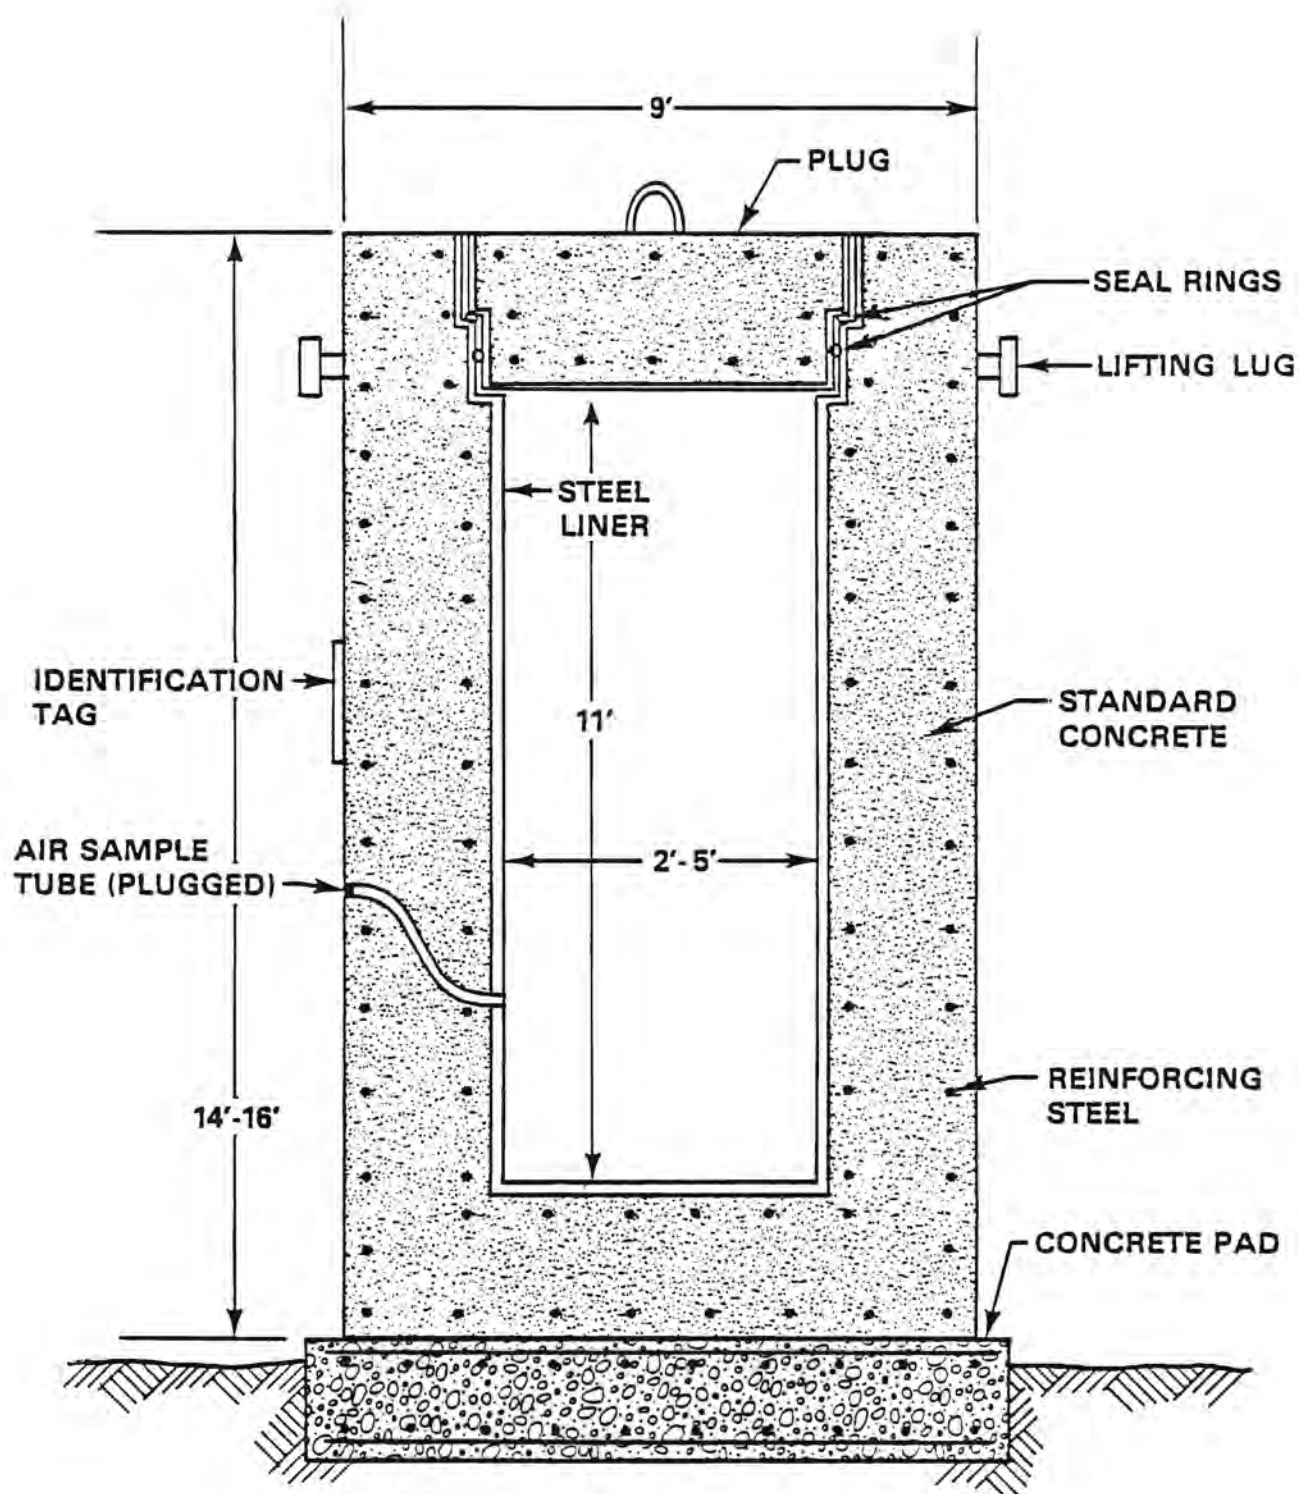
Concrete Cask for RHTRU Waste Storage
